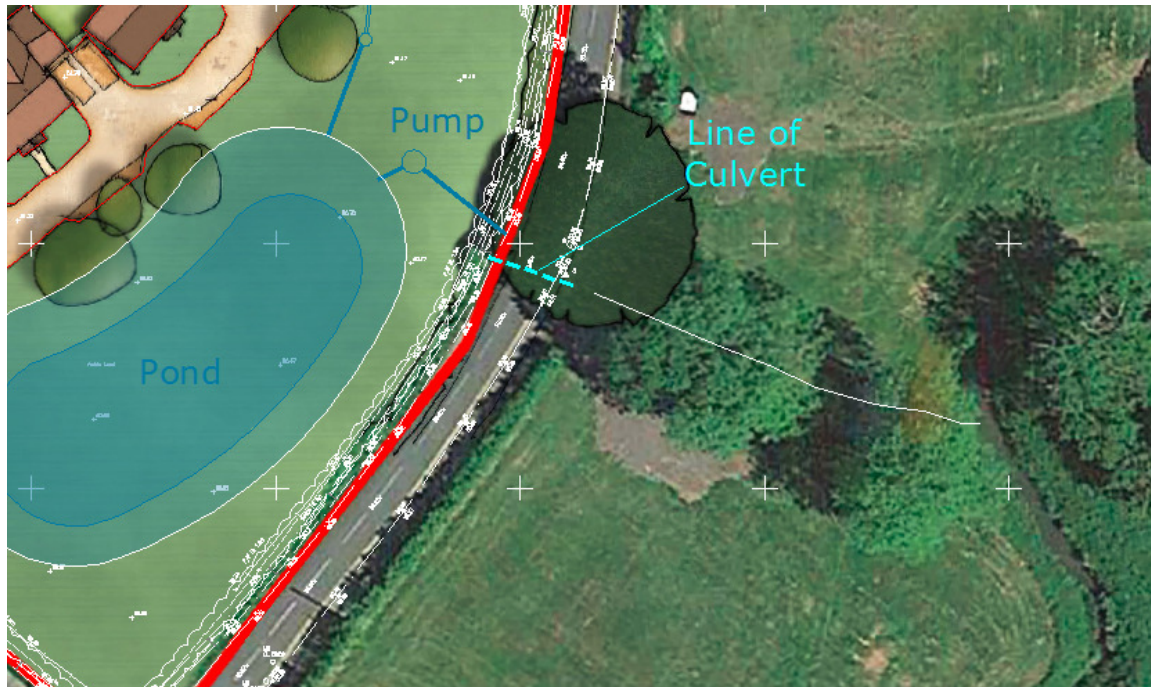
(Extract of Drainage Strategy Showing Culvert Under Station Road)
